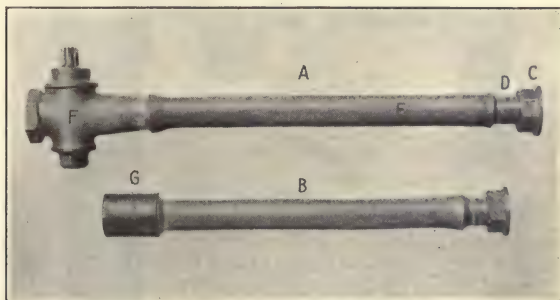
Lead Meter Connections, page 463: A, Inlet Connection; B, Outlet Connection; C, Cap; D, Tailpiece; E, Lead Pipe; F, Meter Cock; G, Coupling.
